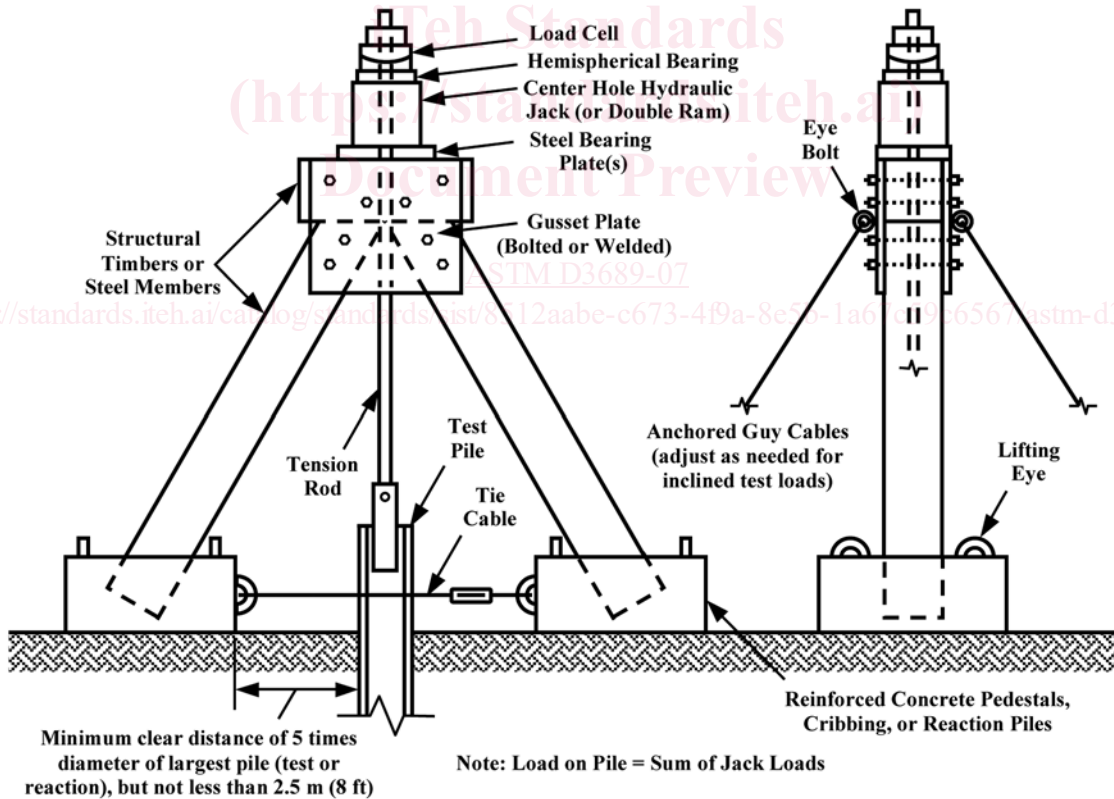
Typical Setup for Tensile Load Test Using Hydraulic Jack(s) Acting at Top of an A-frame
